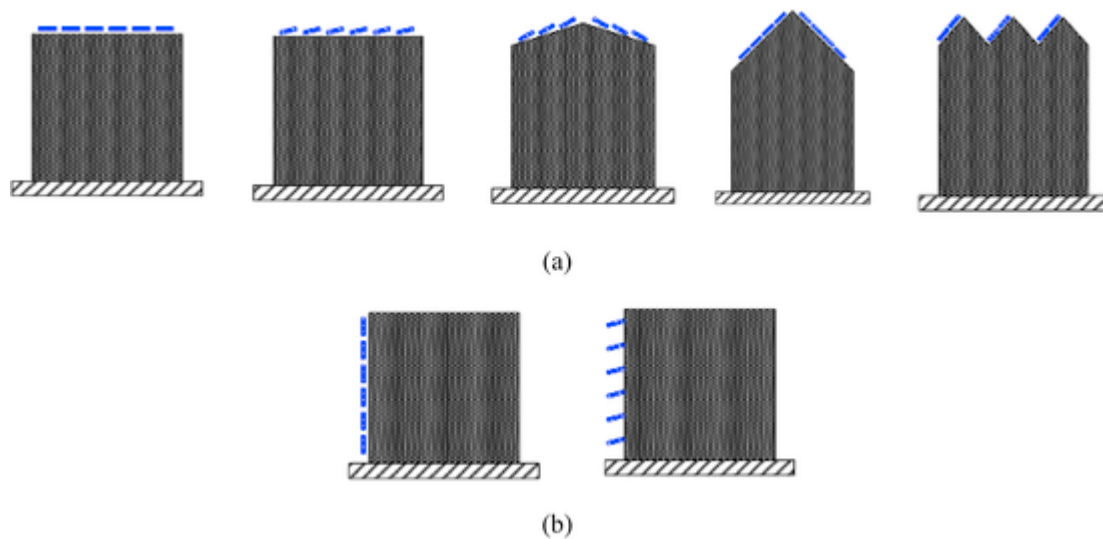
Possible installations of solar panels into building's: (a) Roof, and (b) walls.
